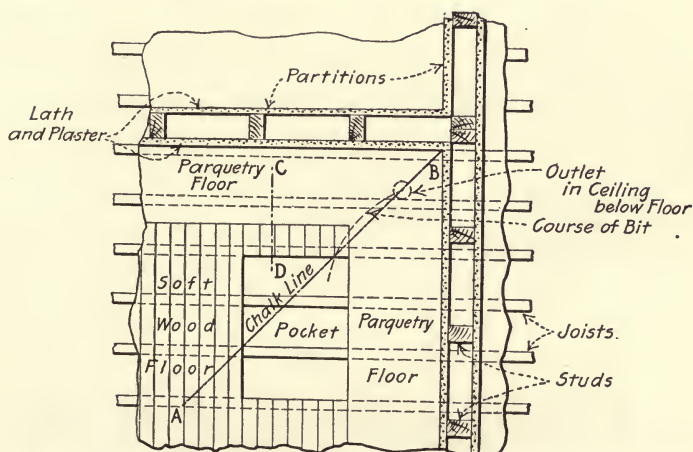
Plan of corner of room having a parquetry floor showing method of reaching outlet in ceiling below.
